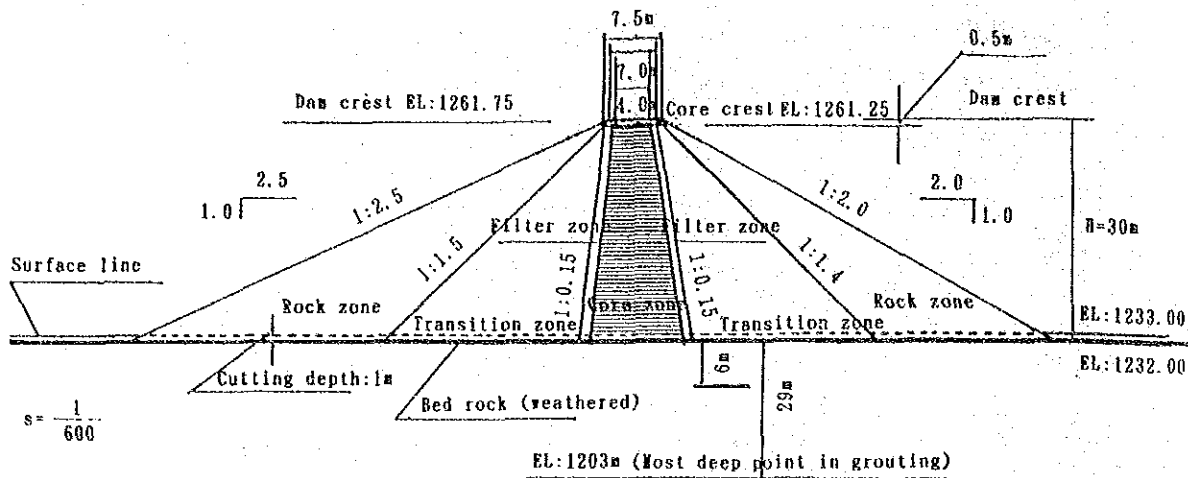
Standard Section of Pantufilas Dam
